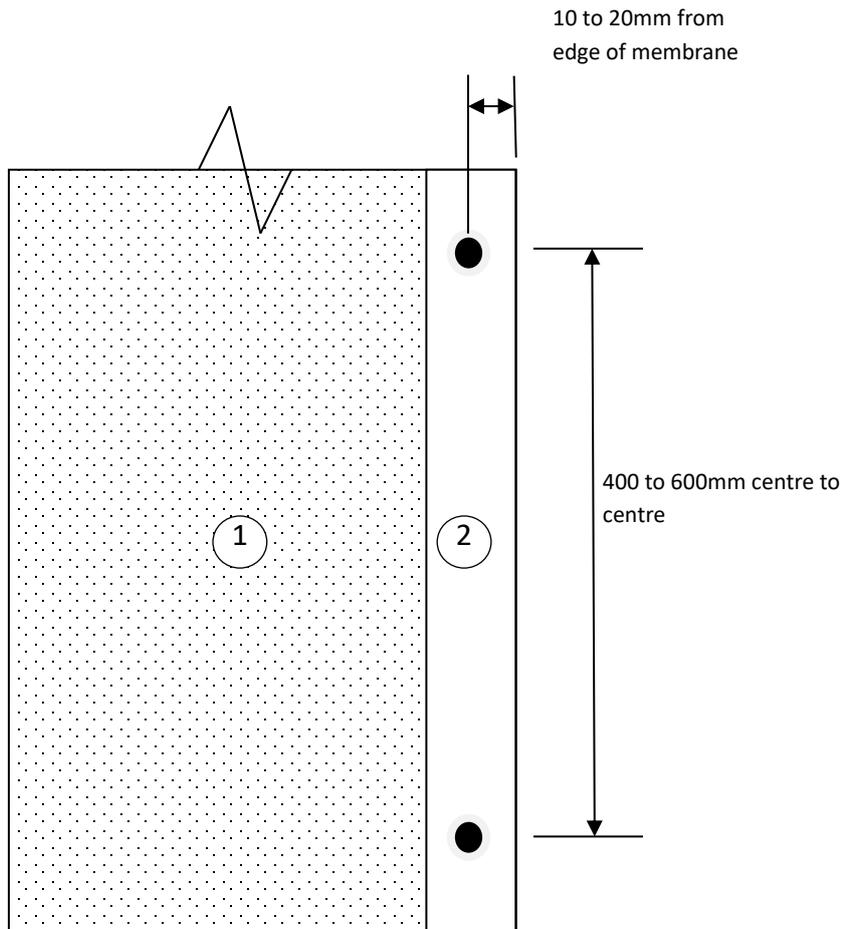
Elevation, showing typical arrangement of mechanical fixings on Enviro BSM
